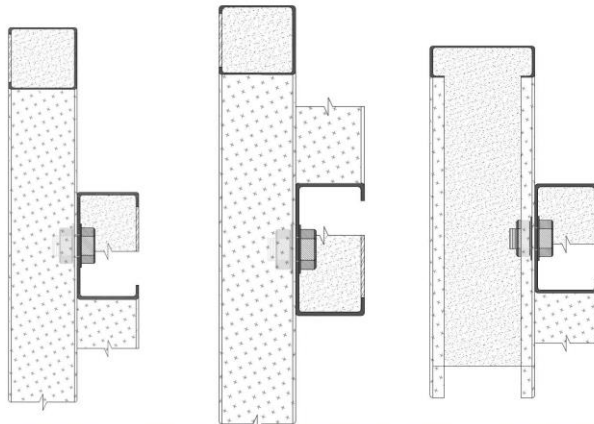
Brace to web of column connection Figure 19 Beam to web of column connection Figure 20 Brace to flange of column connection
